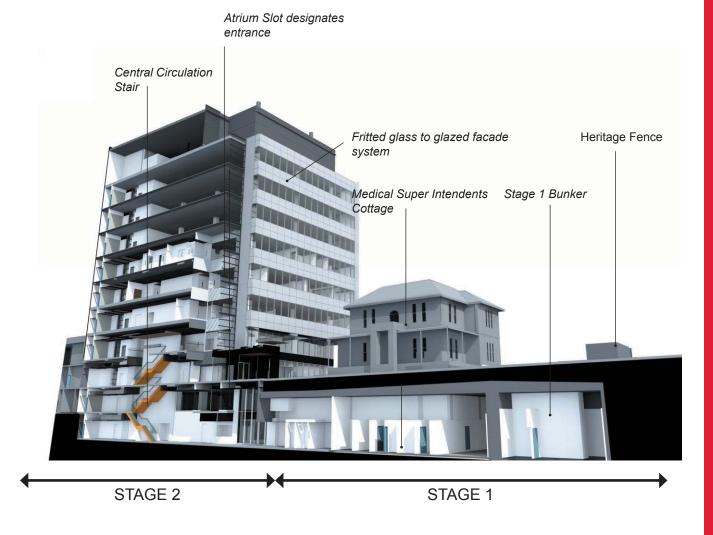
Cross section through new building highlighting link between Stage 1 & Stage 2
